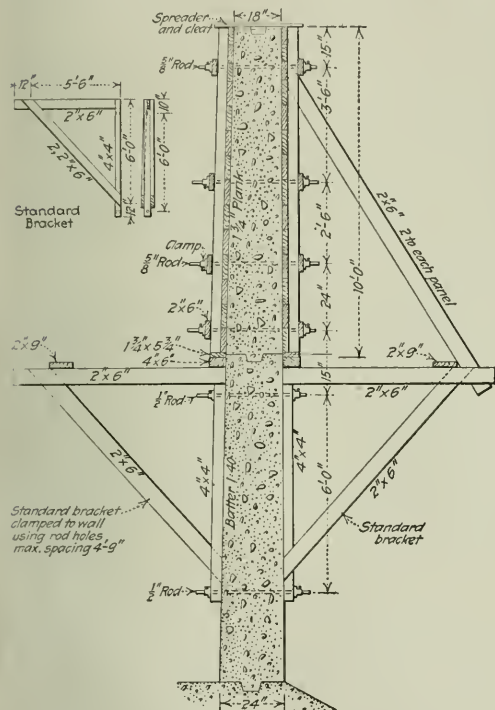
BRACKETS FOR TOP LIFT OF WALL FORMS
